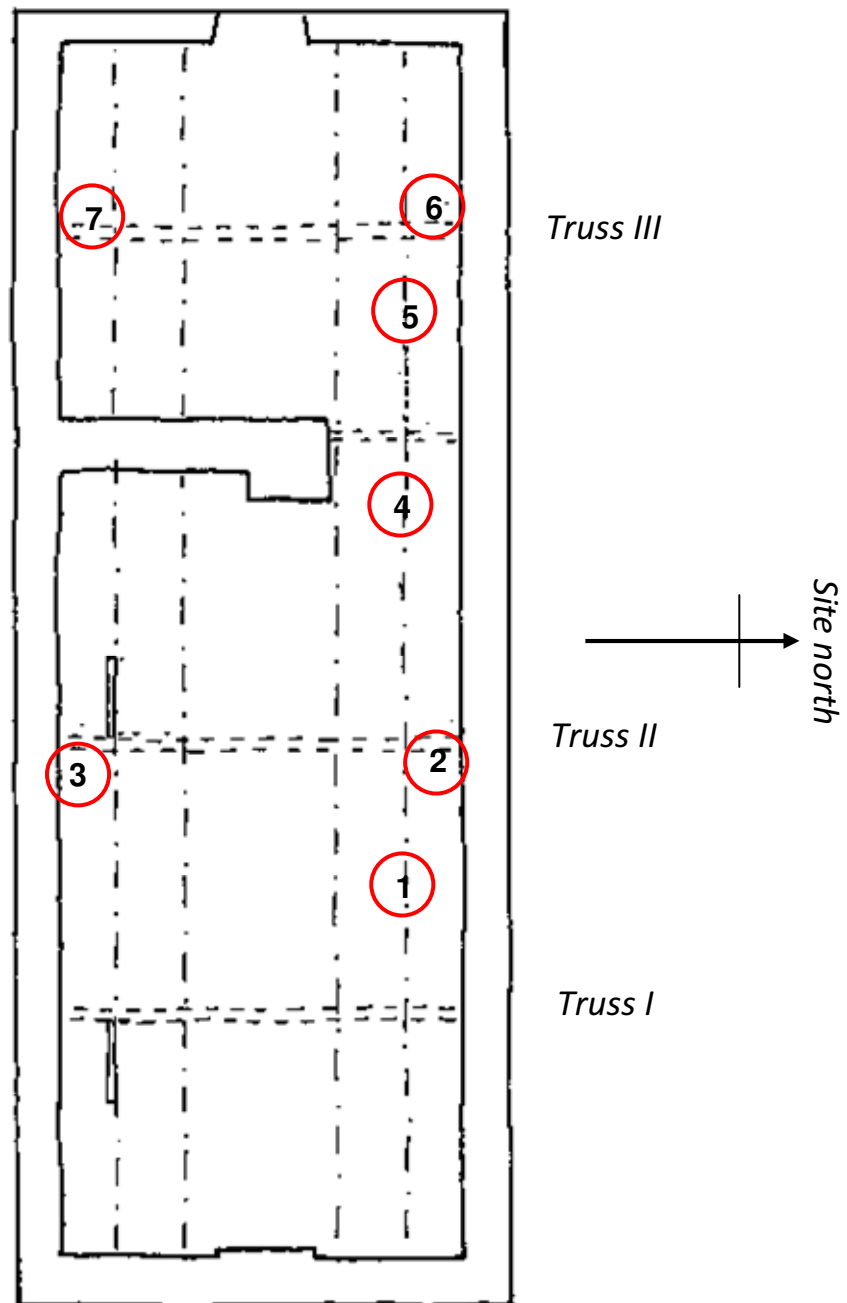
Plan of Brookside House to show arrangement of rooms at ground floor level (after Nick Hill)
